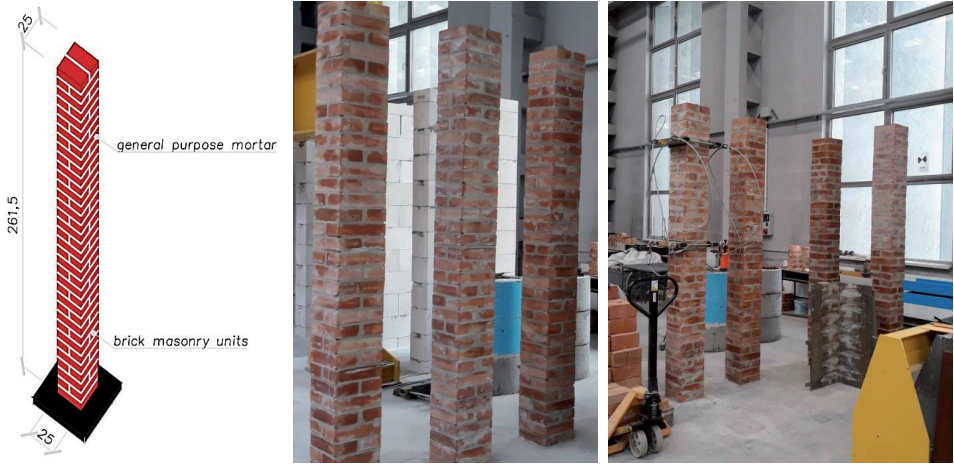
Shape and dimensions of the brick masonry column model in compression tests: a) shape and dimensions of the column model b) made column models
